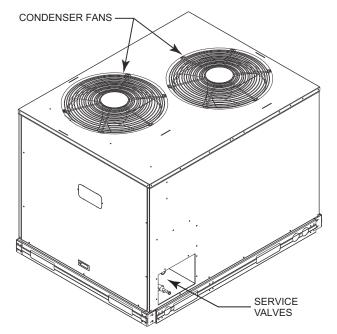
Typical Exterior, Single-Circuit Unit (CAS090, 091 shown)
